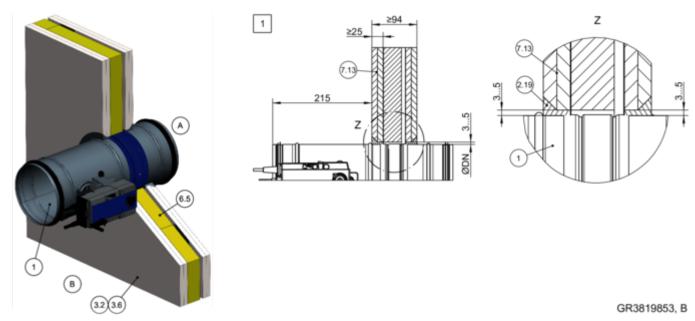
Dry mortarless installation into a lightweight partition wall, without installation kit
